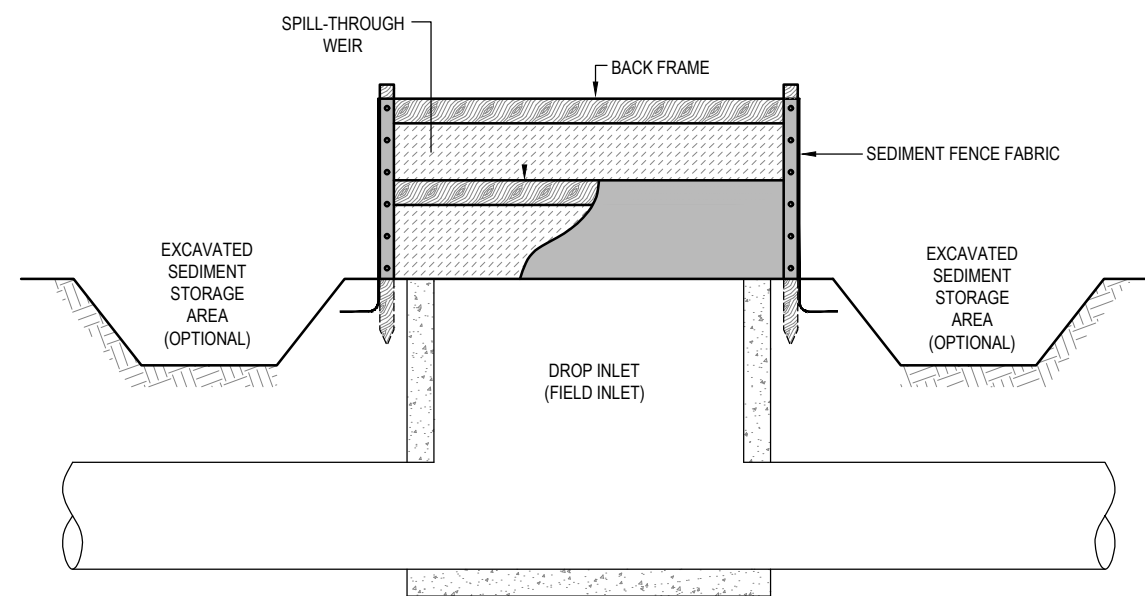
DETAILS OF SUPPORT FRAME WITH SPILL-THROUGH WEIR
